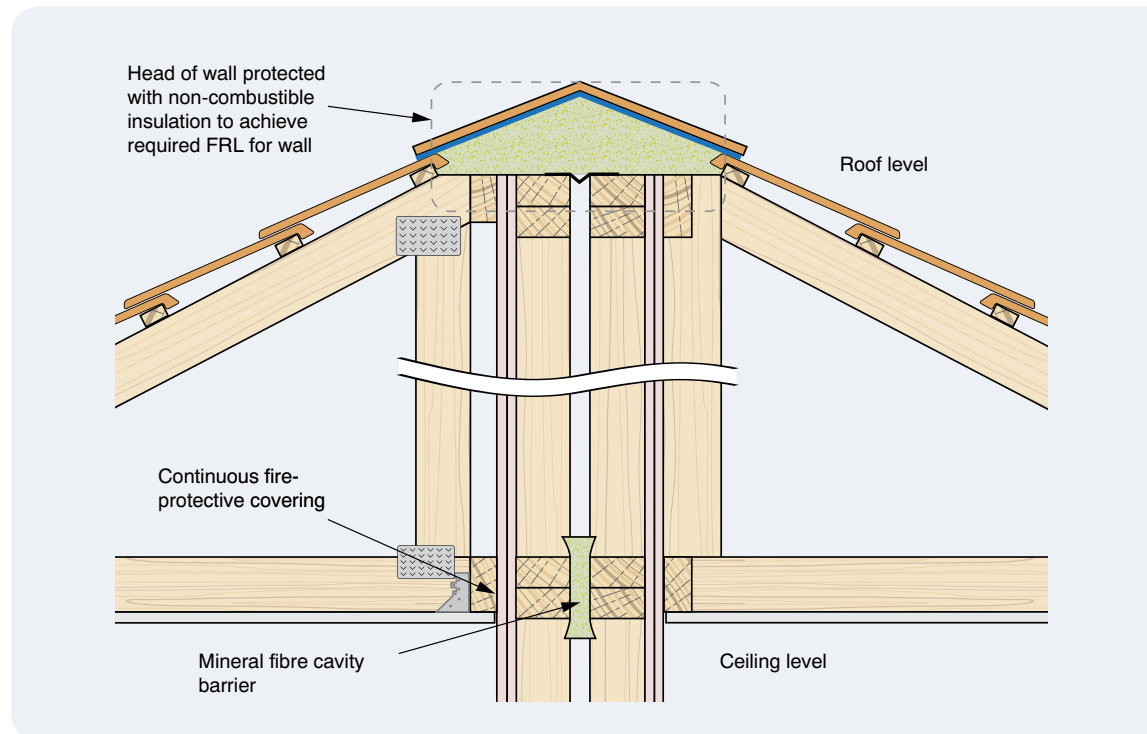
Roof space option 1 extending SOU bounding fire-protected timber walls to roof level.
